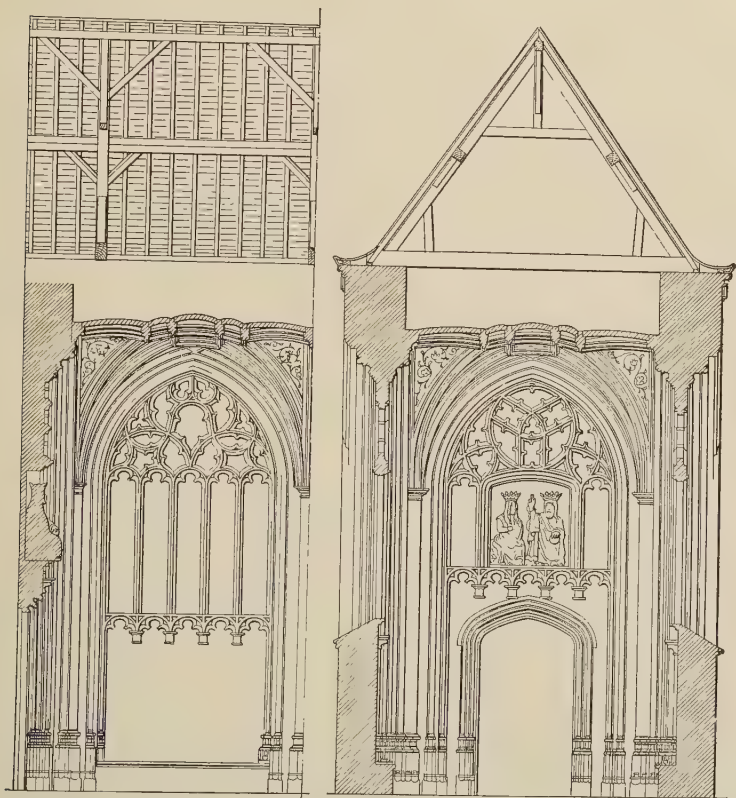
LONGITUDINAL AND TRANSVERSE SECTIONS OF CHURCH OF ST. JACQUES, LIEGE
